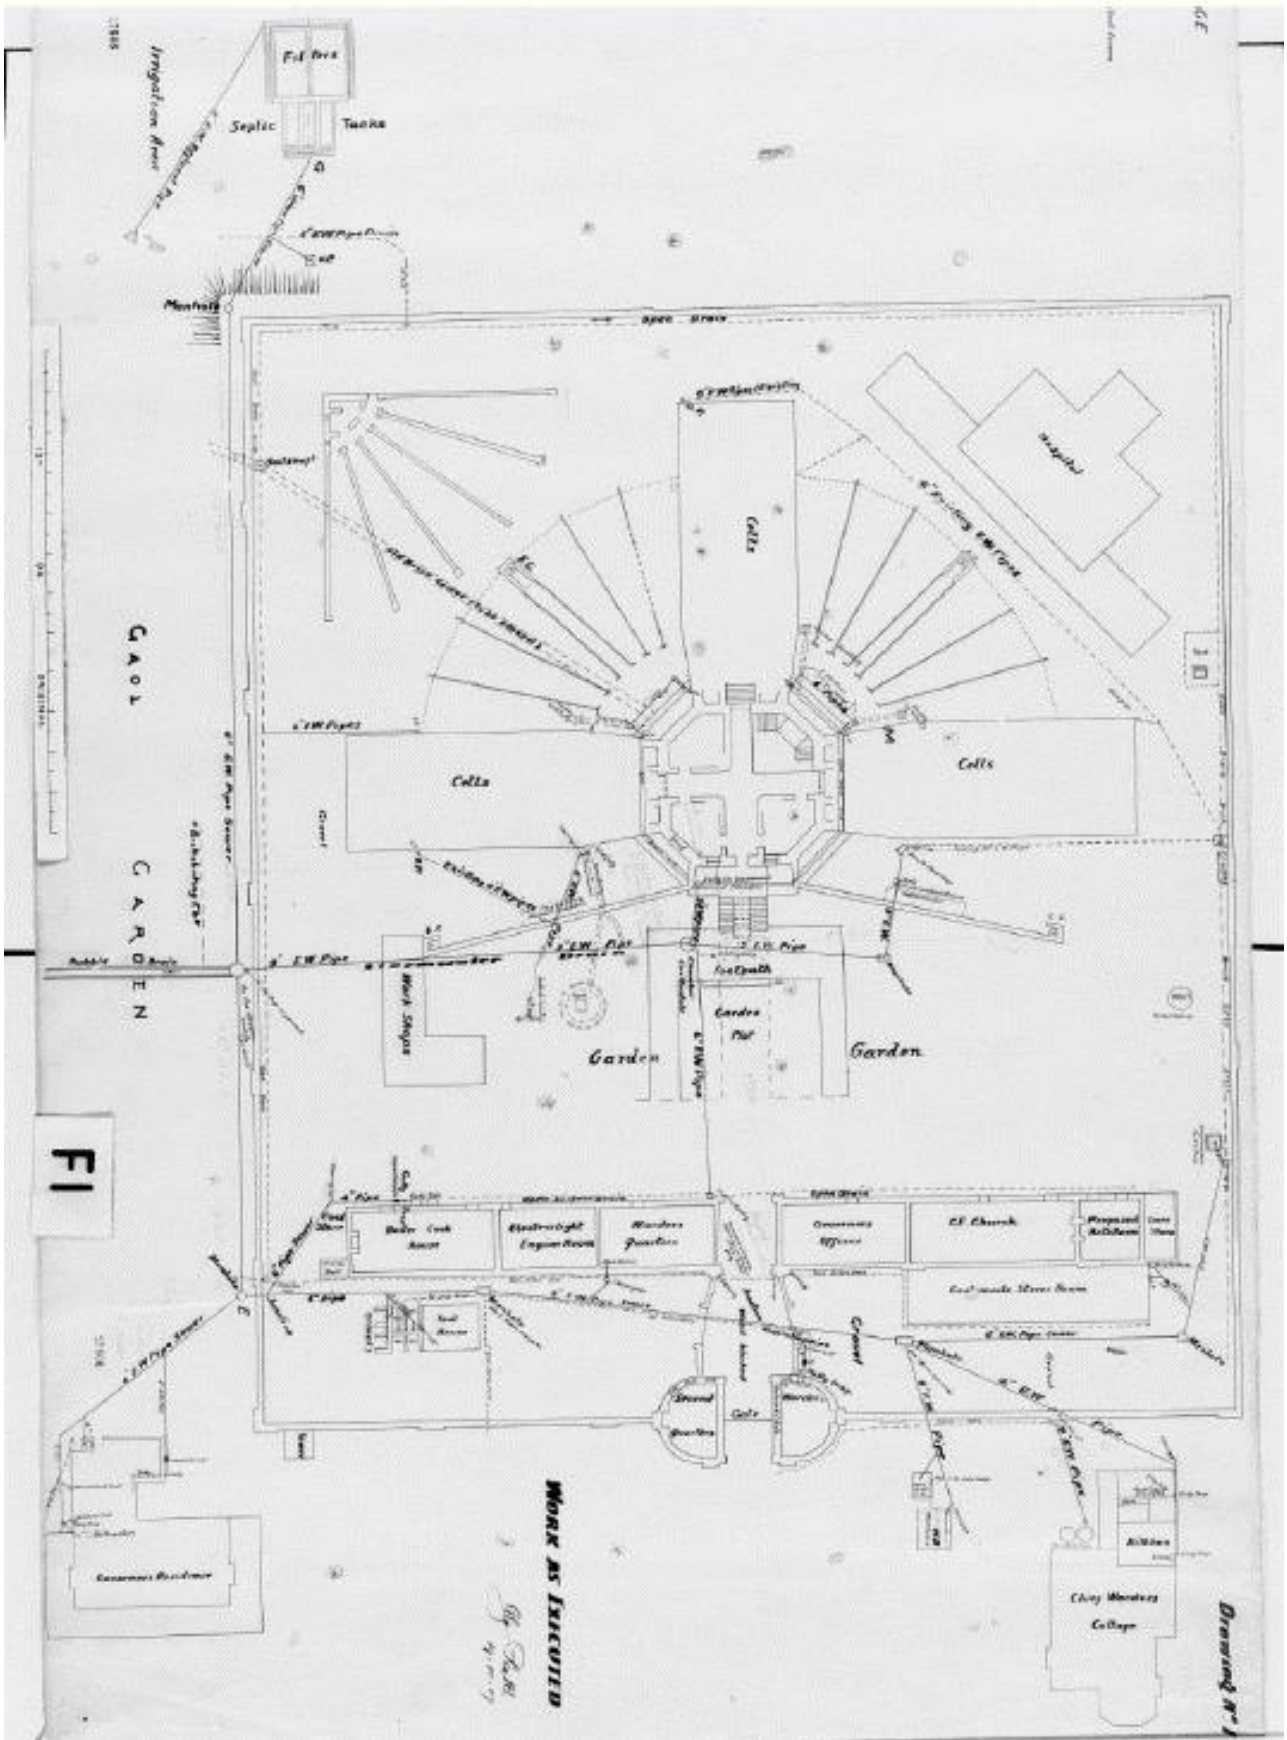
19 October 1907 plan outlining the new sewerage and drainage system for the site ‘as executed’, with the location of the new septic system at top left. The plan illustrates structures within the gaol and the residences outside the gaol walls.
